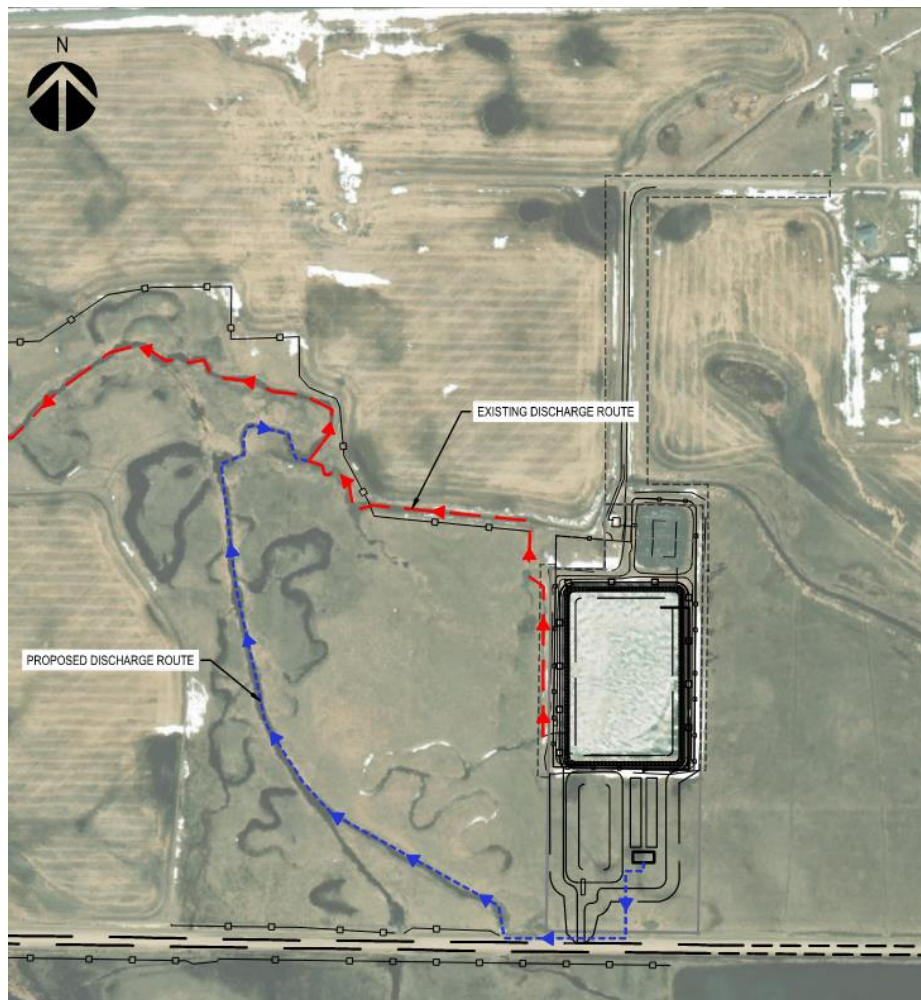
Proposed Wastewater Treatment Lagoon Discharge Route – Local Area
